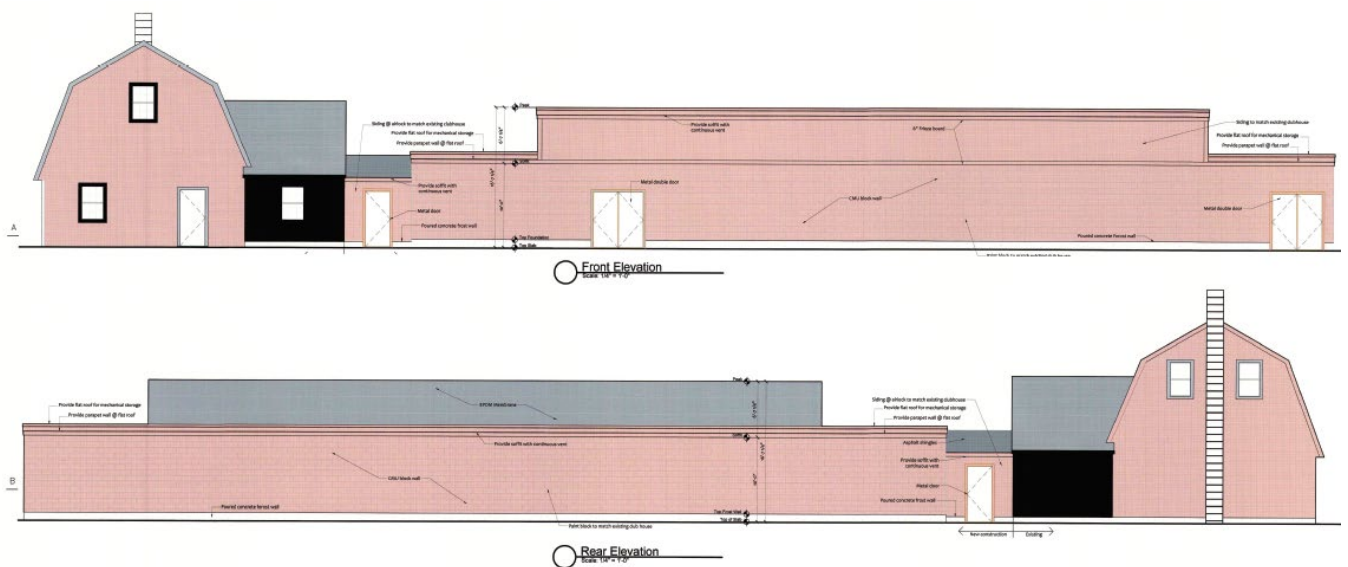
Snippet of approved elevations from SPR-01-13, Mod. 2
